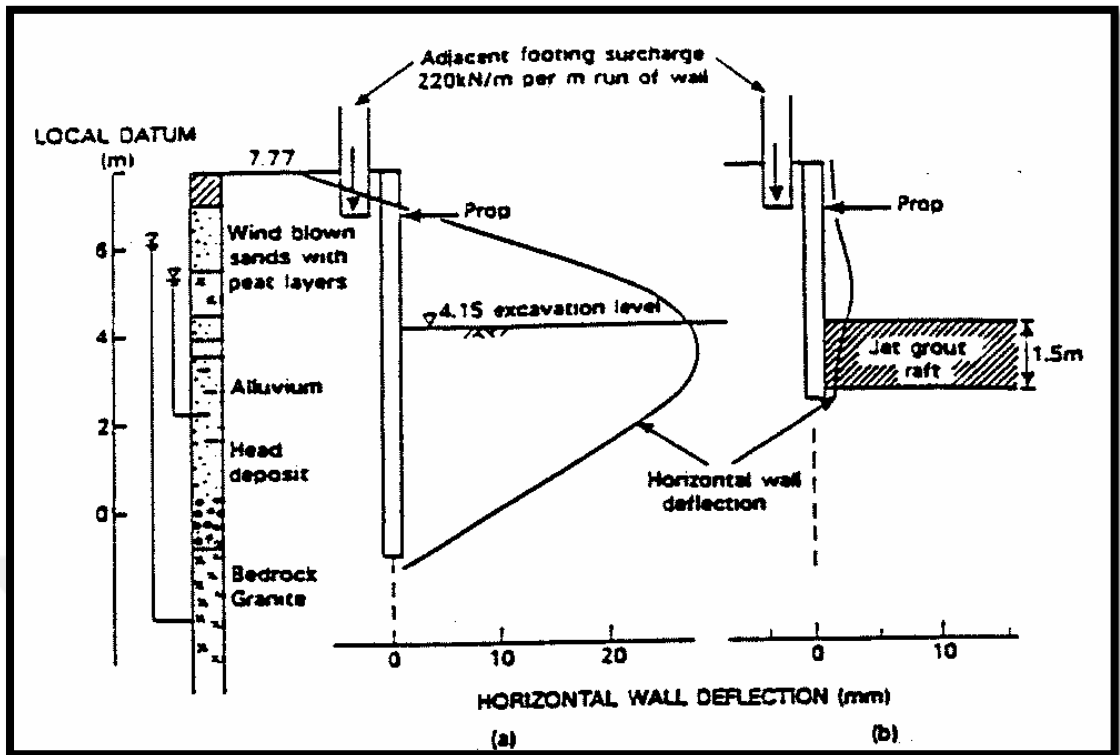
Maximum wall deflection (a) without a jet grout raft; (b) with a jet grout raft (after Newman et al., 1992)
